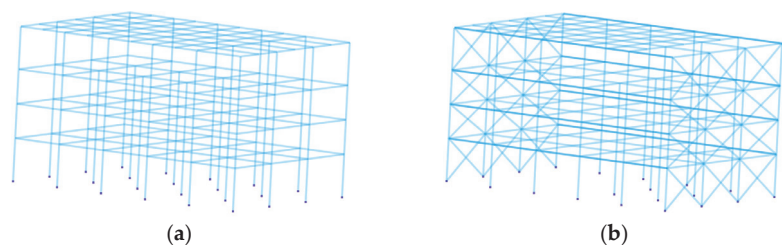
Finite element models of RC frame structures. (a) KJ1; (b) KJ2.
